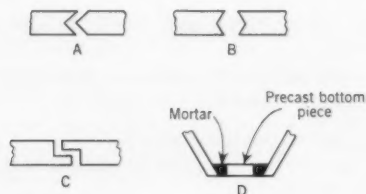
PRECAST CONCRETE SLAB FOR LINING
